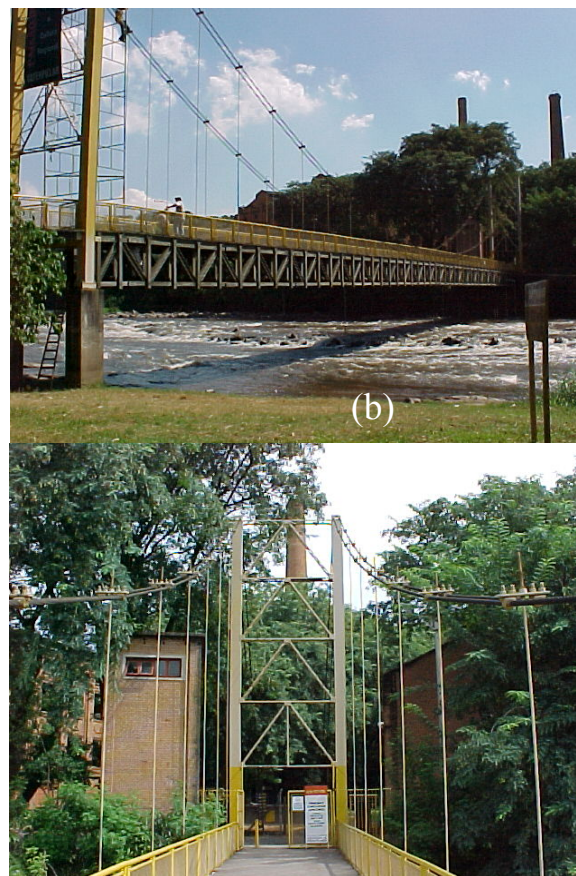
Footbridge of Piracicaba (a) lateral view e (b) tower
